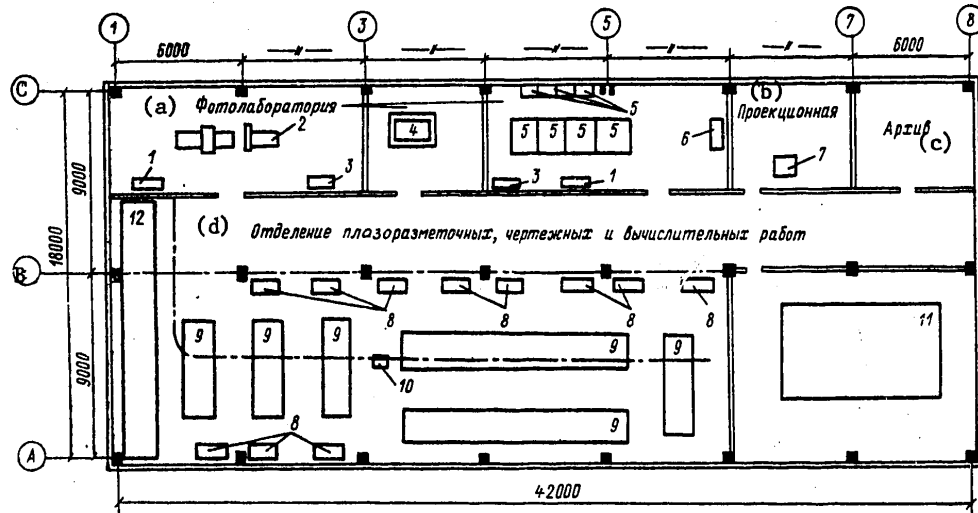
Layout of the mold loft operations department. Department of mold loft layout operations, drawing and calculating operation; photo laboratory
